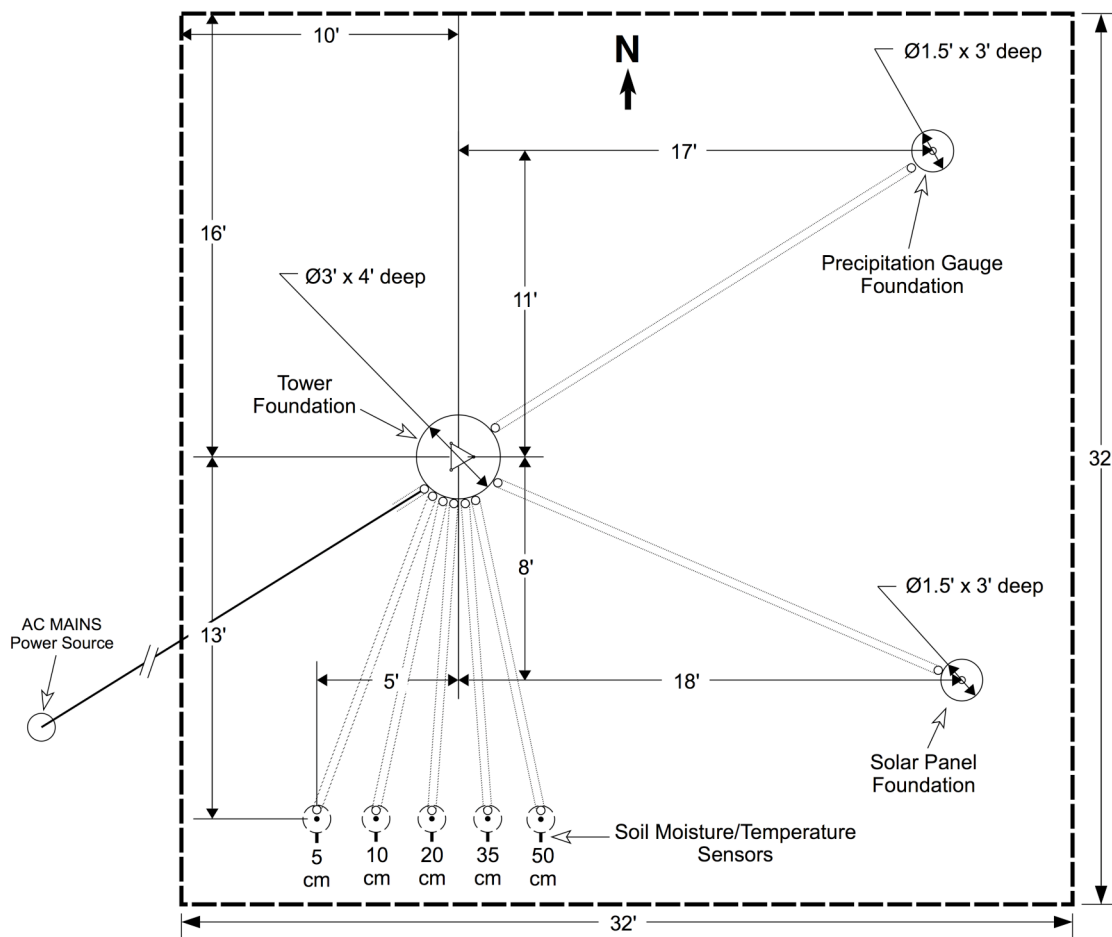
Plan view of a station plot that measures 32-by-32 feet showing the placement of foundations and conduit.
